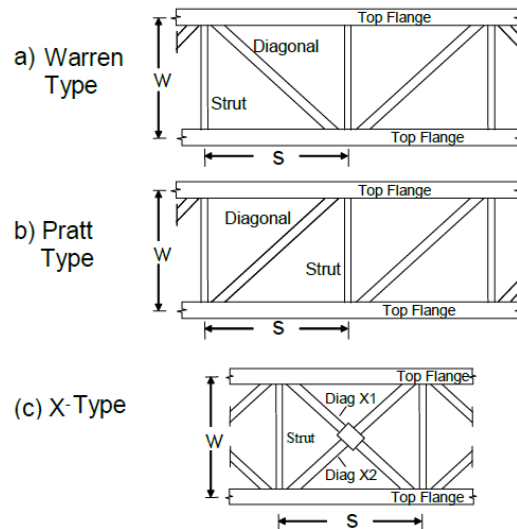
Top Lateral Bracing Layouts (Helwig and Yura 2012)
